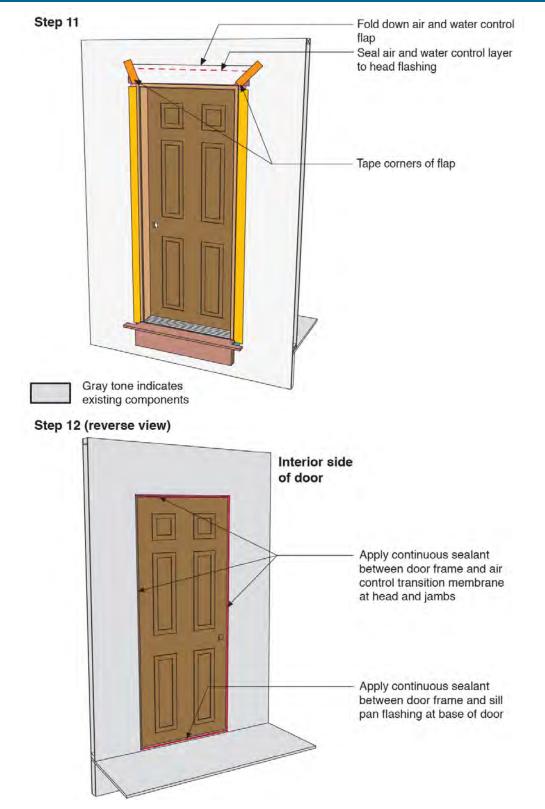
Steps 11 and 12 of installation sequence for new door or reinstalled door in a high performance mineral fiber retrofit wall assembly
